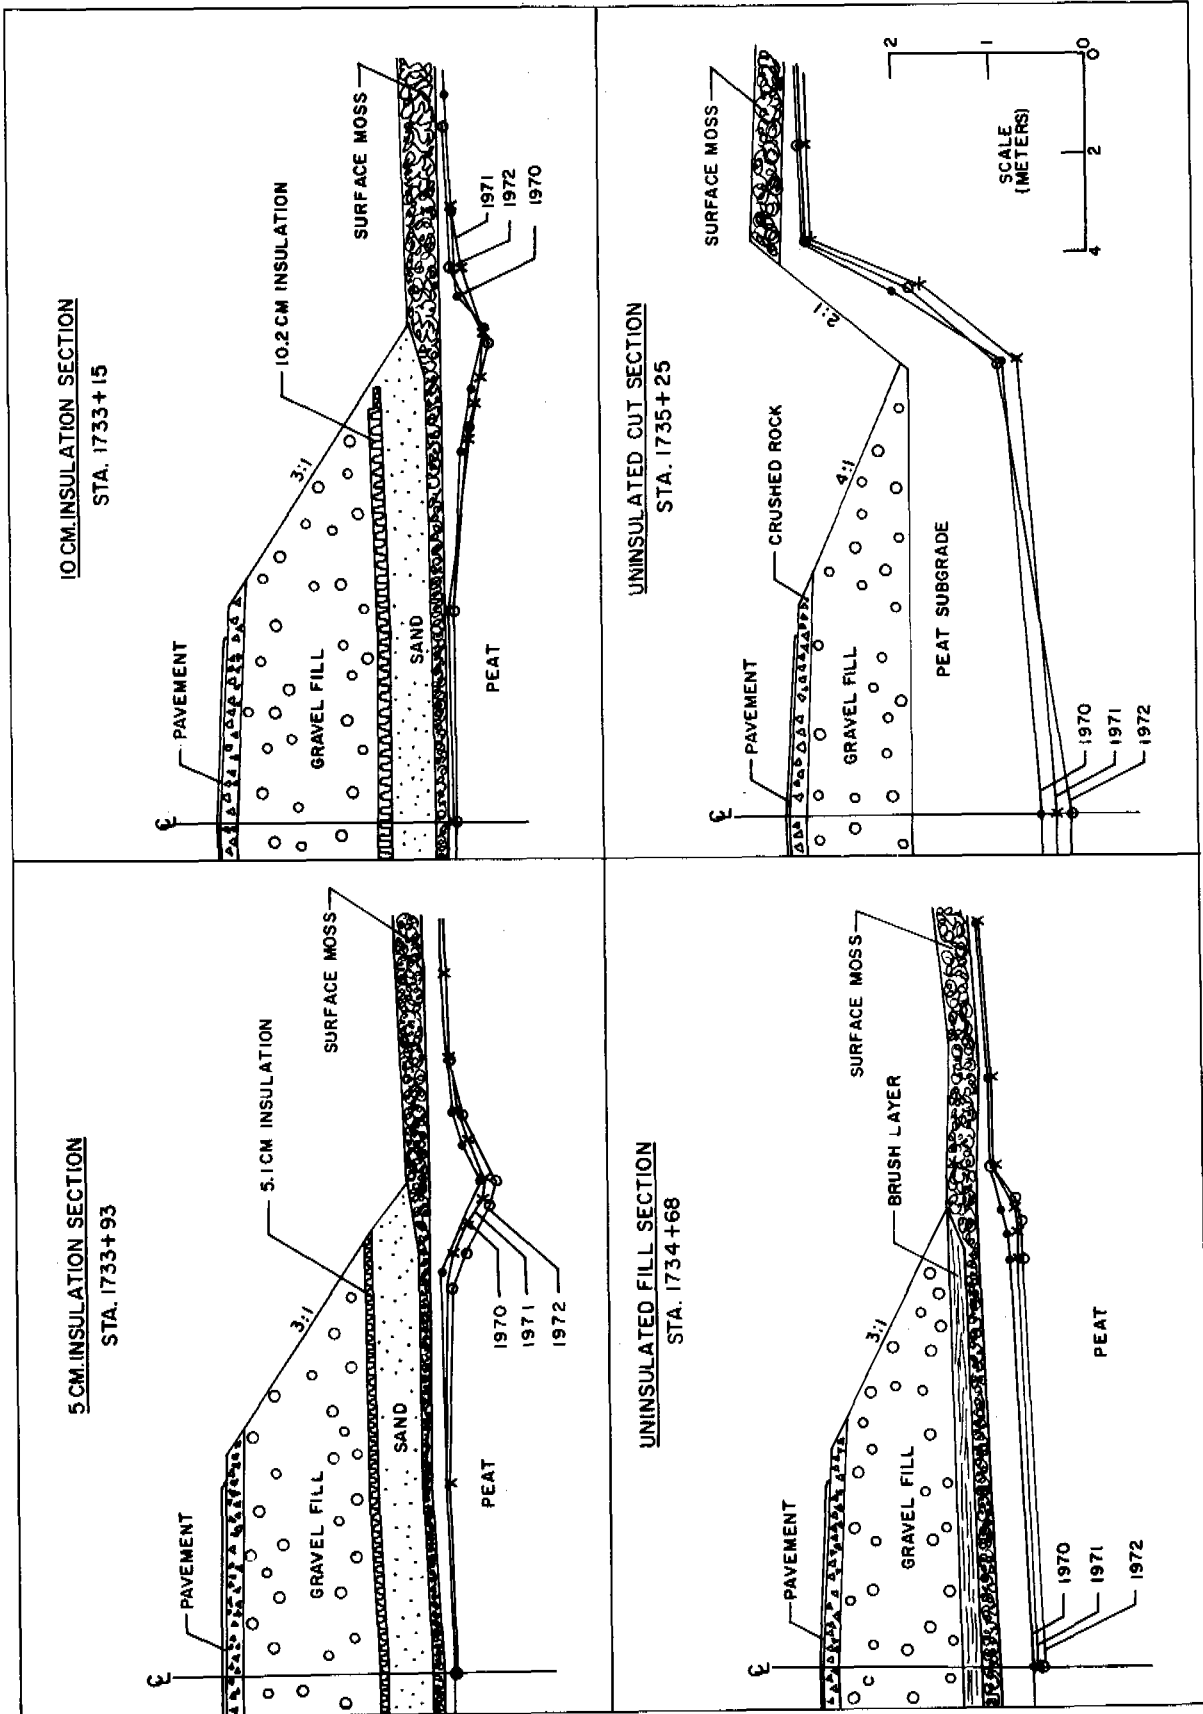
Cross sections of insulated and uninsulated roadway sections, showing maximum seasonal thaw depths.
